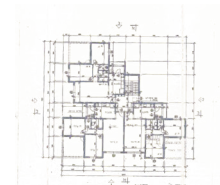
Floorplan of an apartment building in Harish, 1992. Dauber Architects. (Harish Council Archive)
